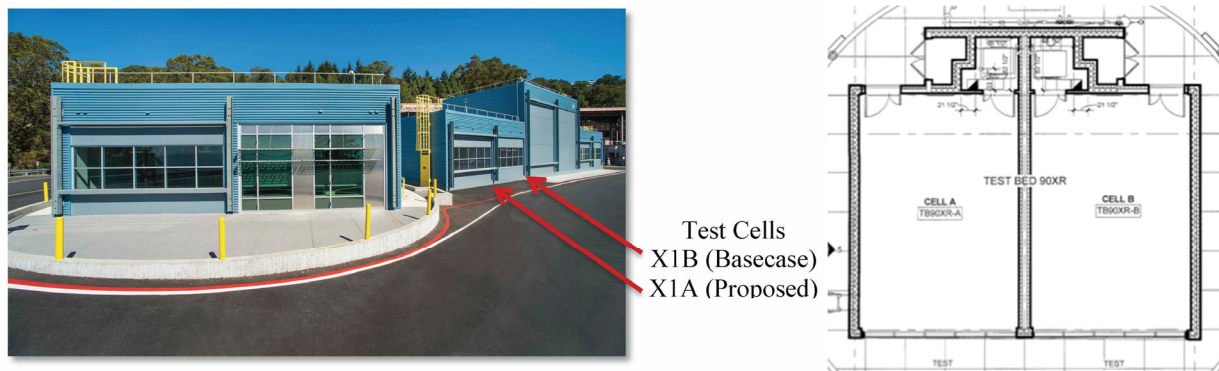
FLEXLAB Test Cells Image & Floorplan, Proposed (Cell A) & Basecase (Cell B).
